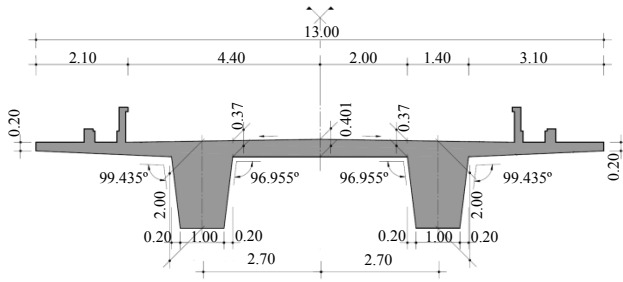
São Martinho Viaduct cross-section (in meters). Adapted from [13].
